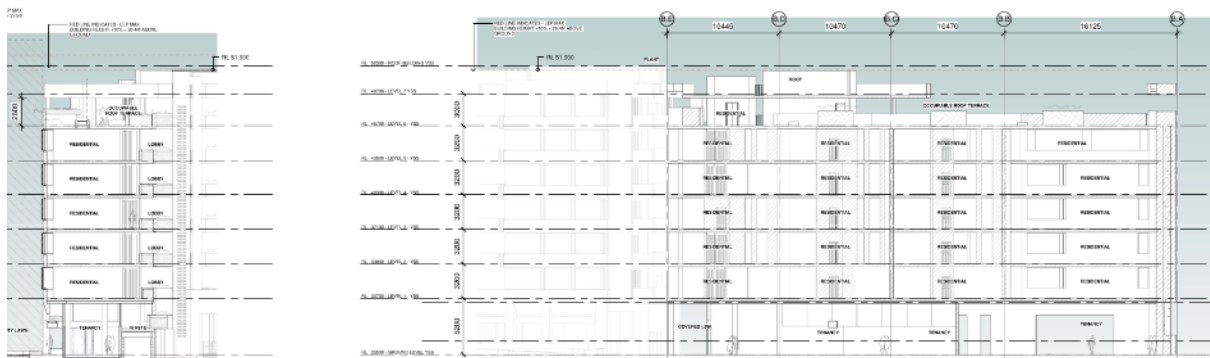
Long and short section plans: Young Street South Building, including communal private open space
